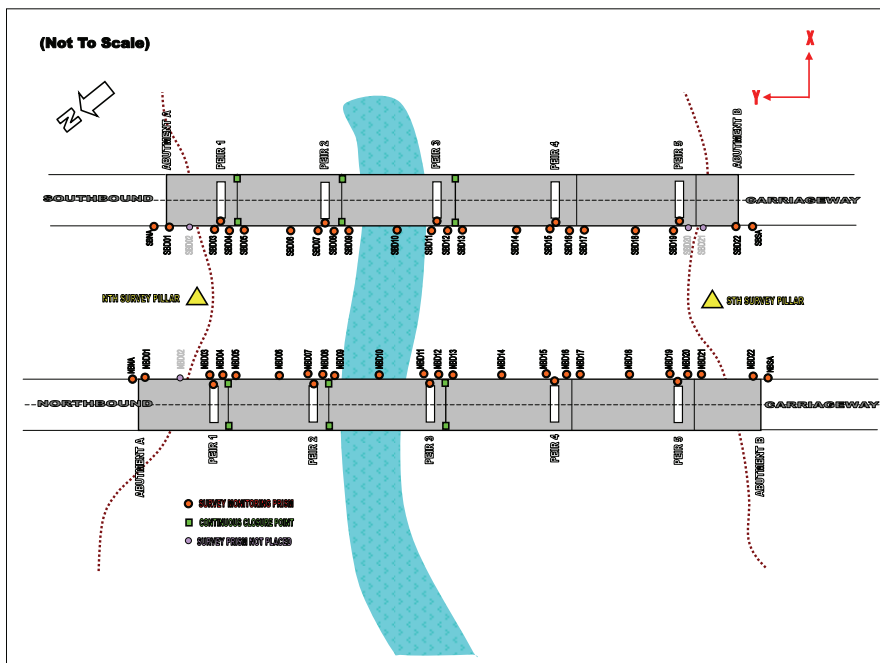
Plan of the relative 3D monitoring points on the Nepean Twin Bridges (Source: IC)
